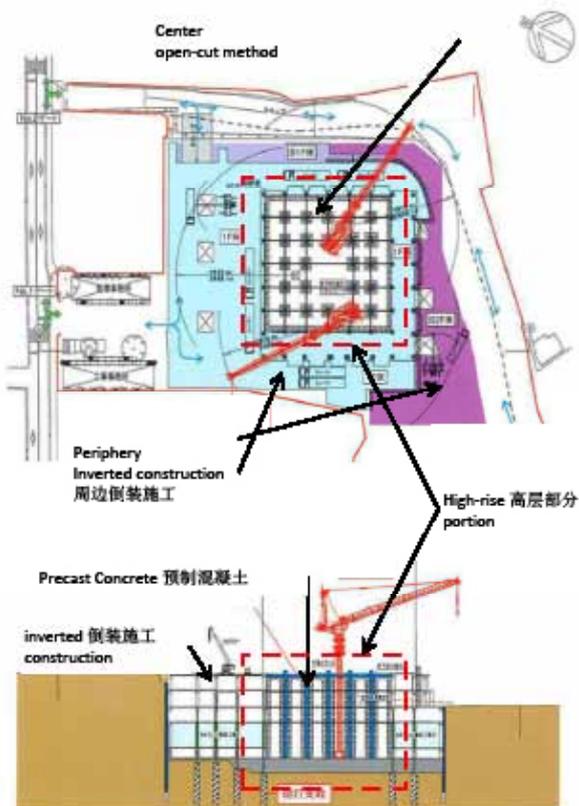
Plan of Temporary Works of Underground Construction (Source :Obayashi Corporation)
